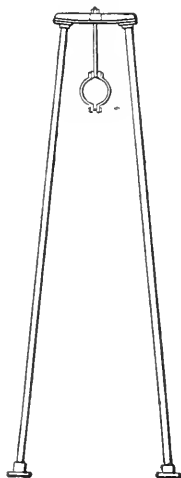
A FRAME PIPE SUPPORT WITH FLEXIBLE PIPE HANGER.
